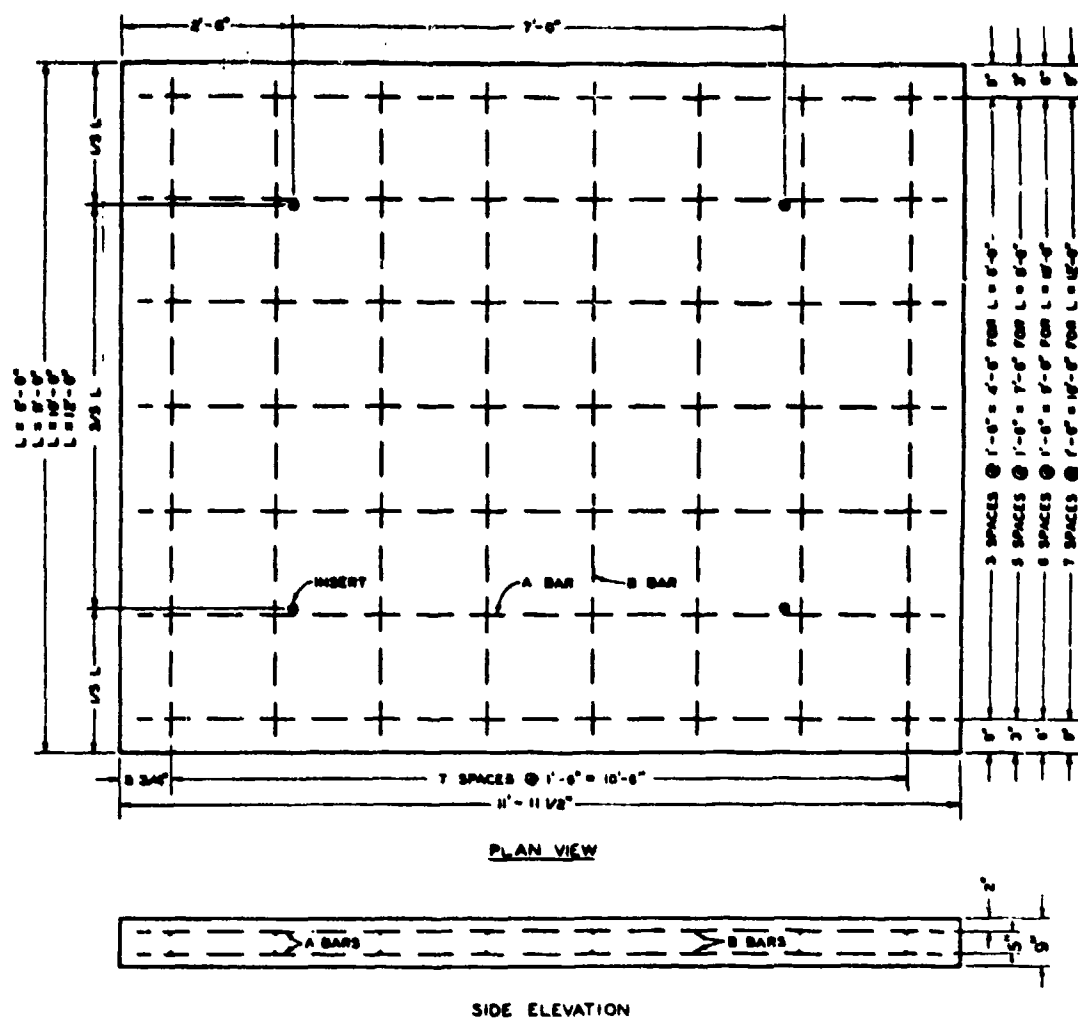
Final slab design for test pavement section, Brookings, South Dakota
